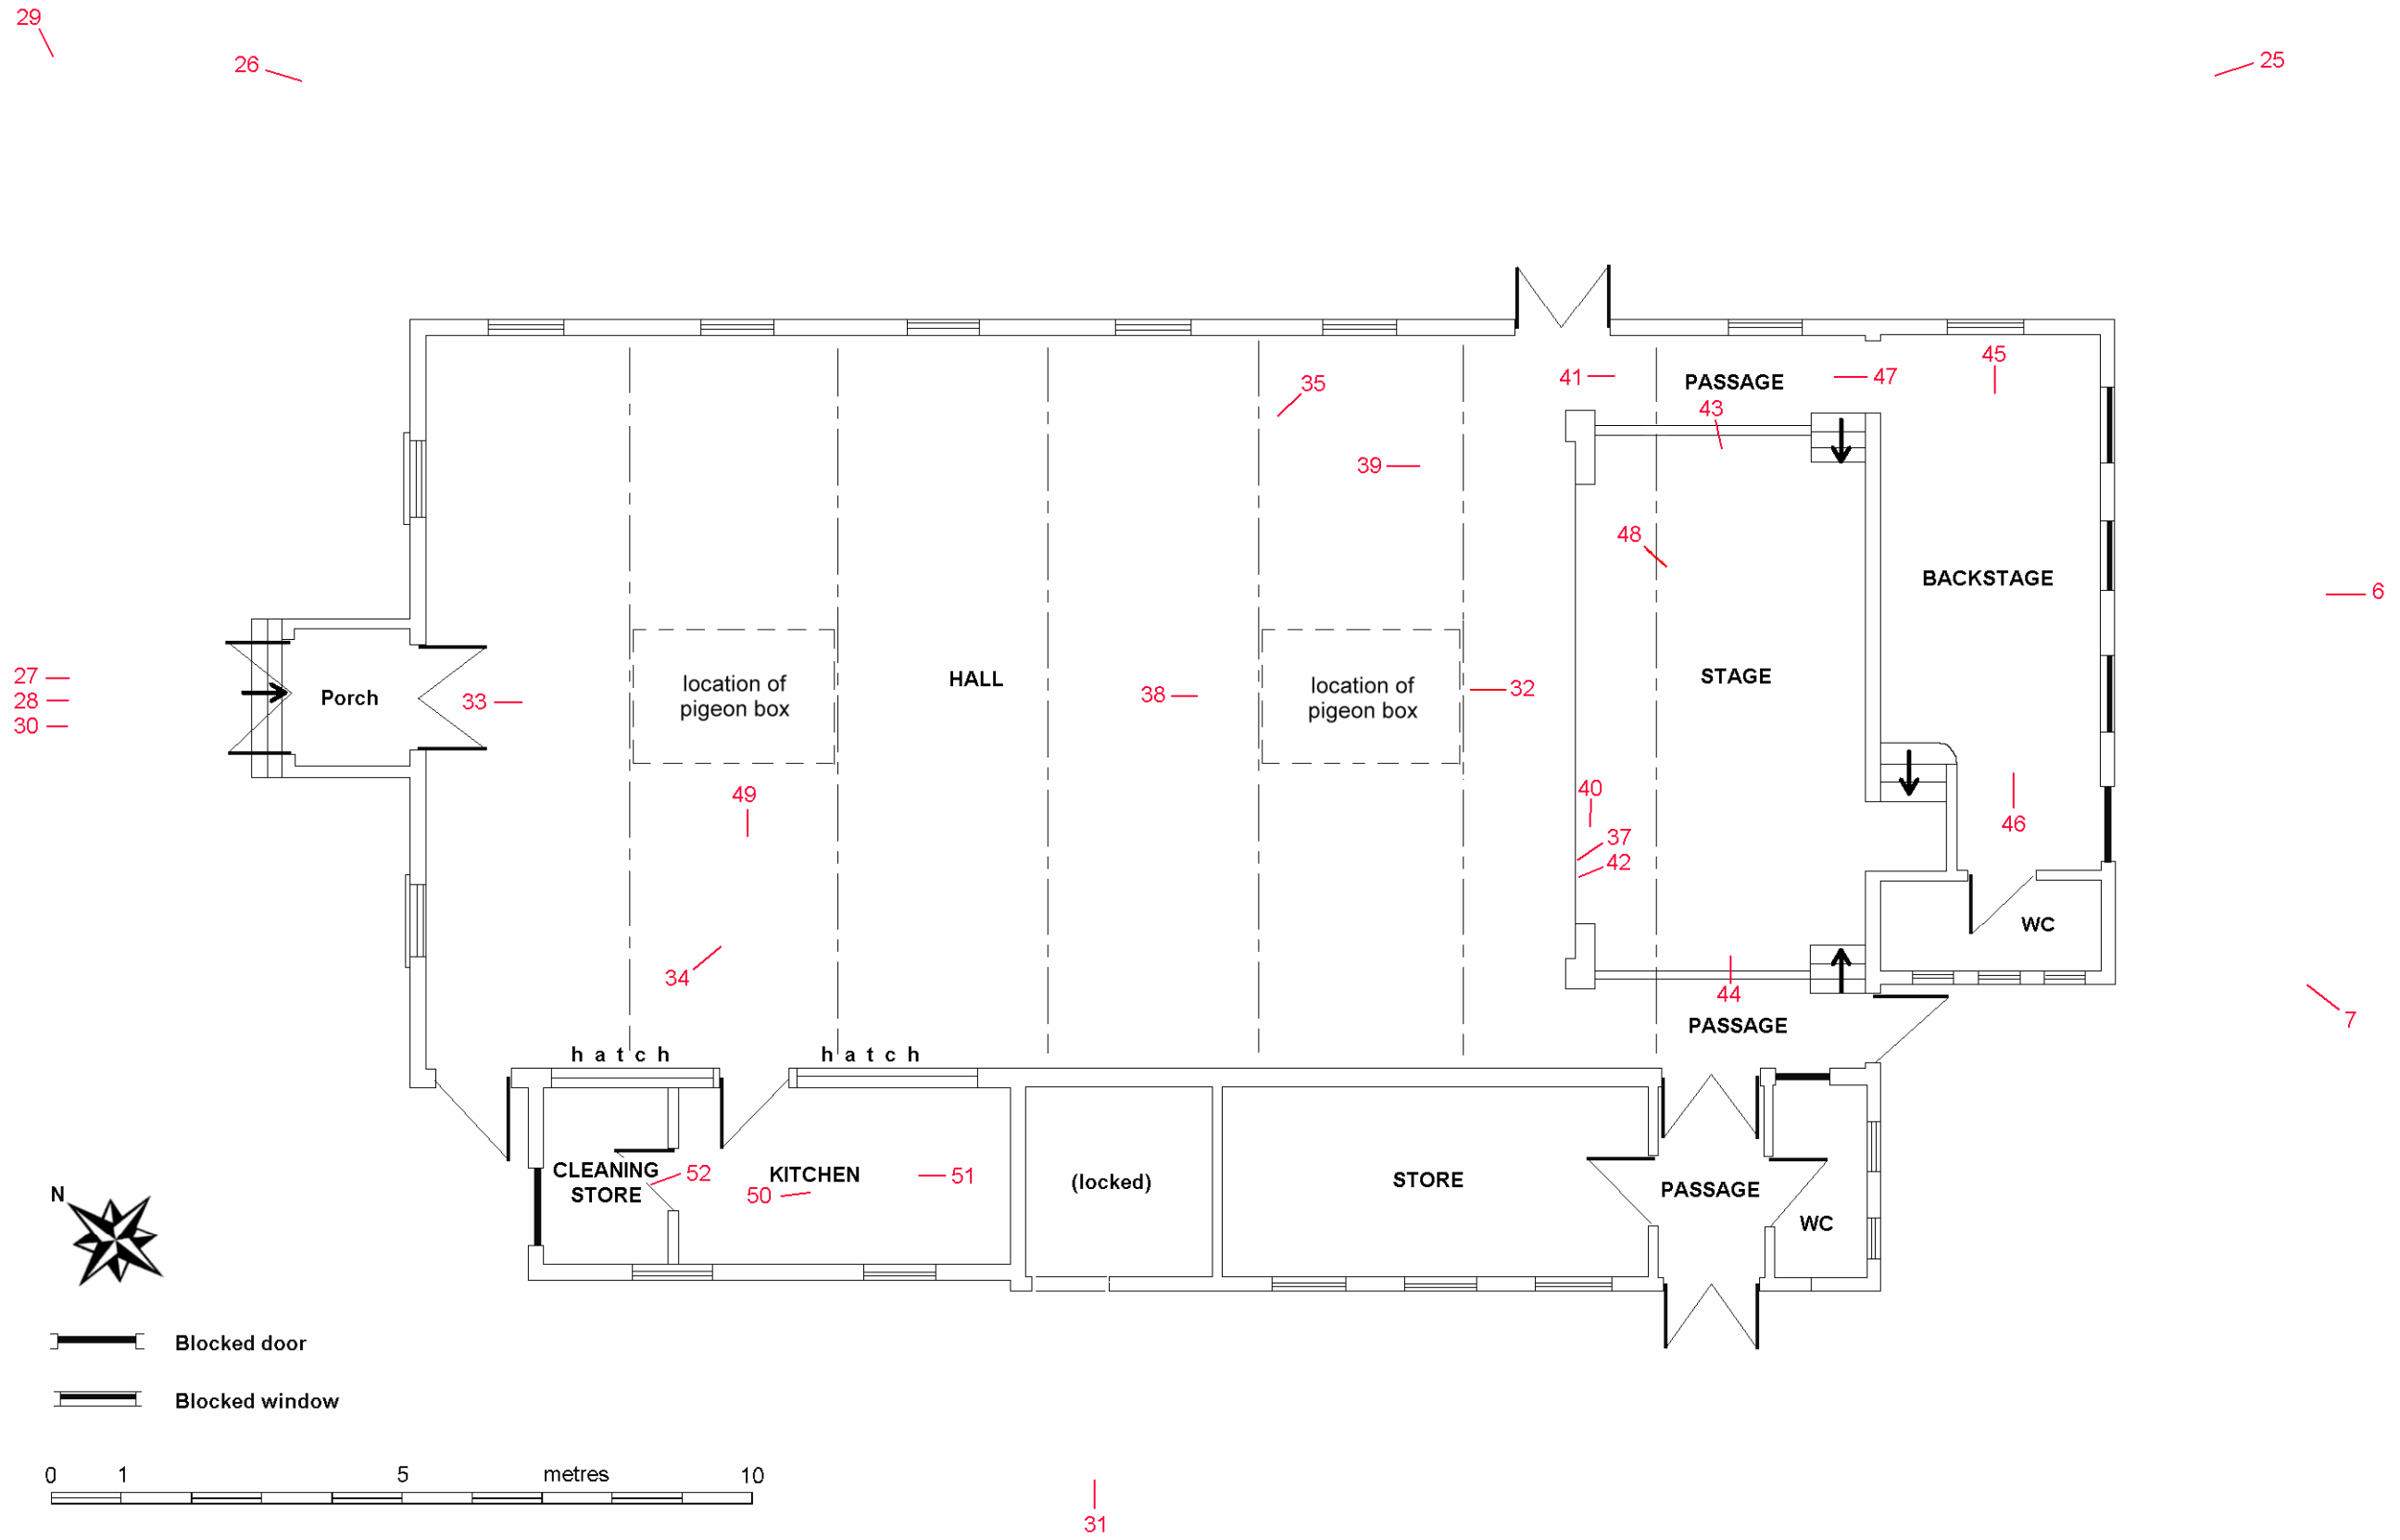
Church Hall: plan and photo locations (scale 1:100)
